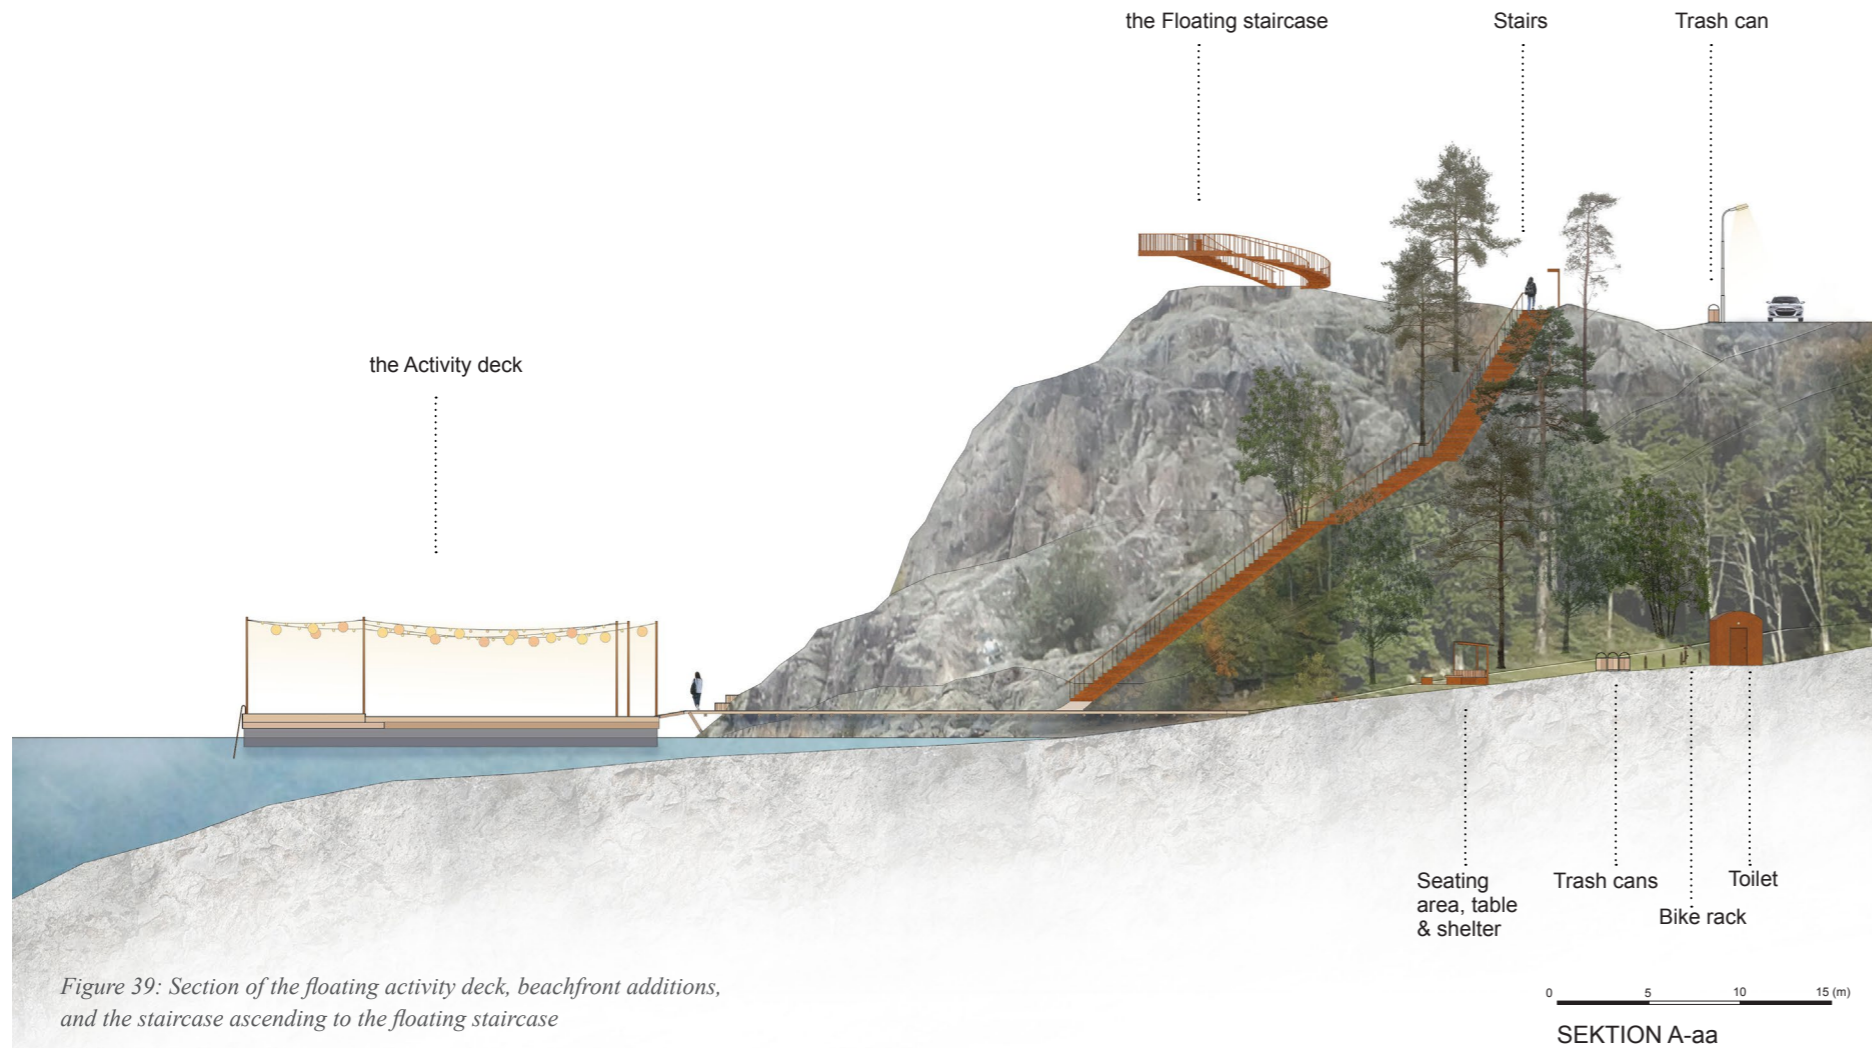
Section of the floating activity deck, beachfront additions, and the staircase ascending to the floating staircase
